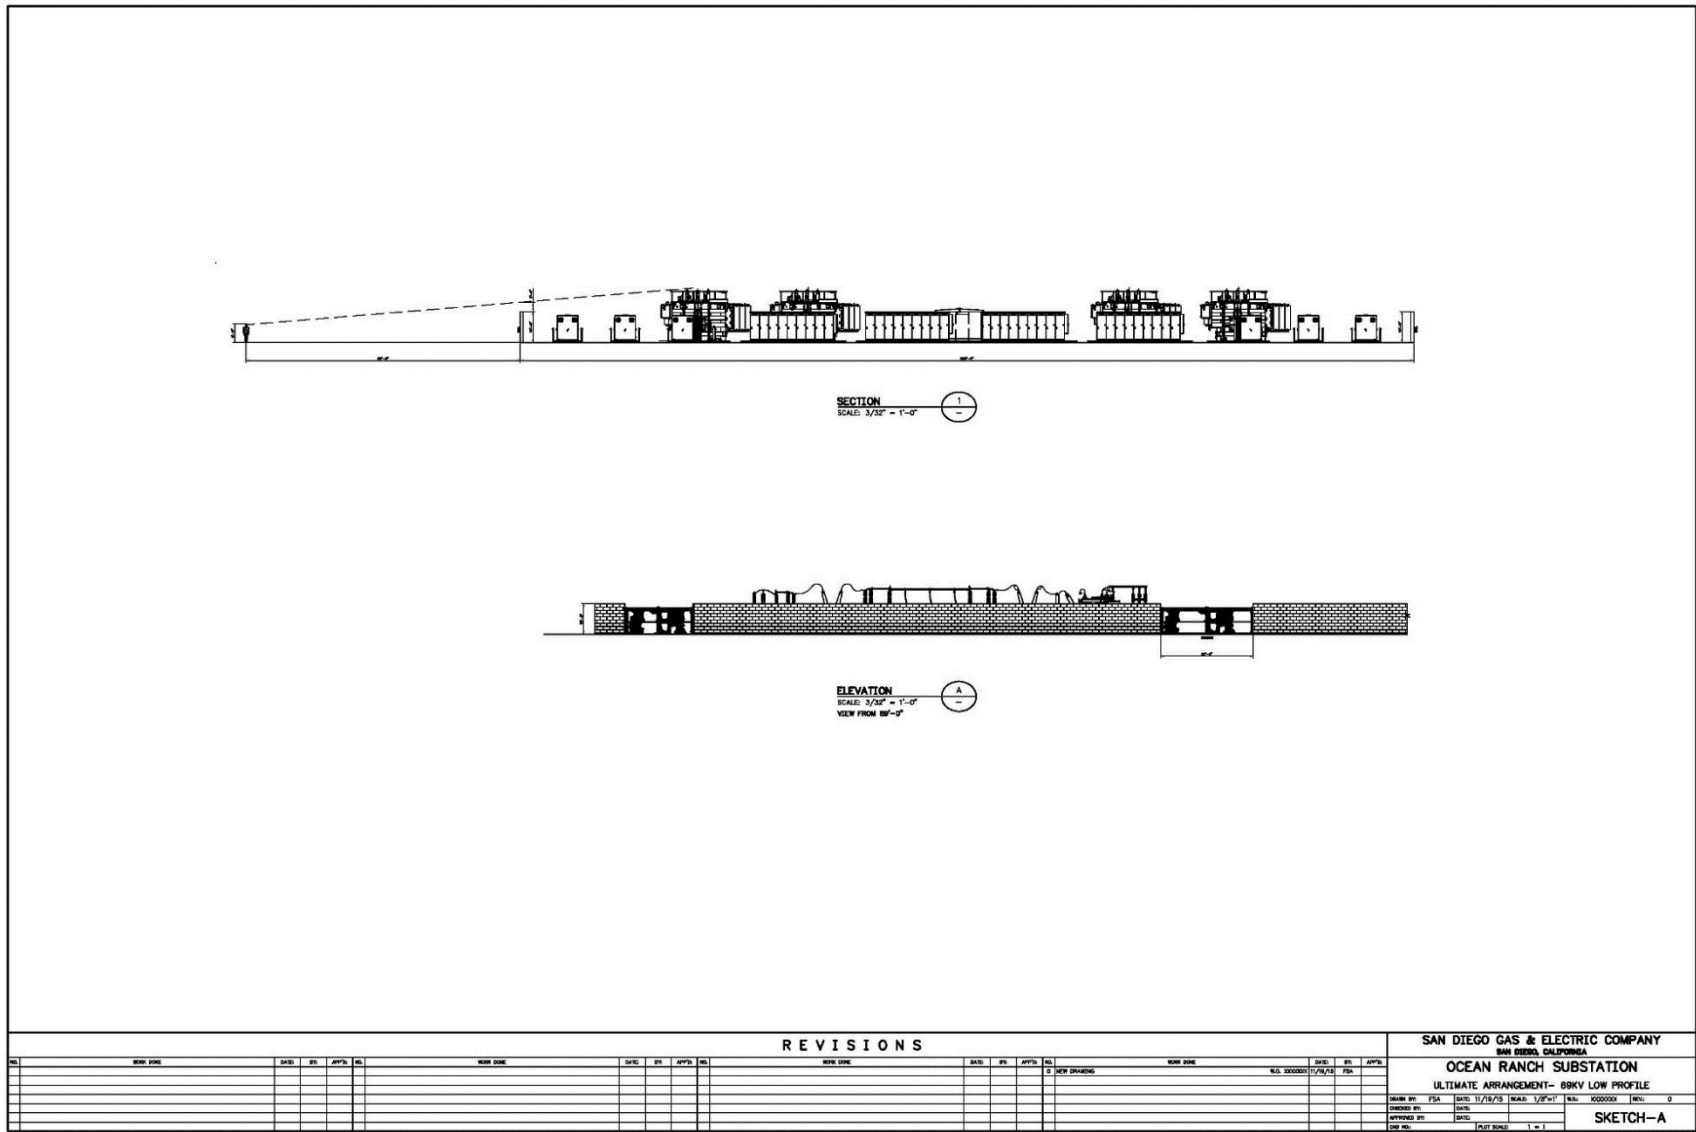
Proposed Ocean Ranch Substation Ultimate Arrangement-69 kV Low Profile
